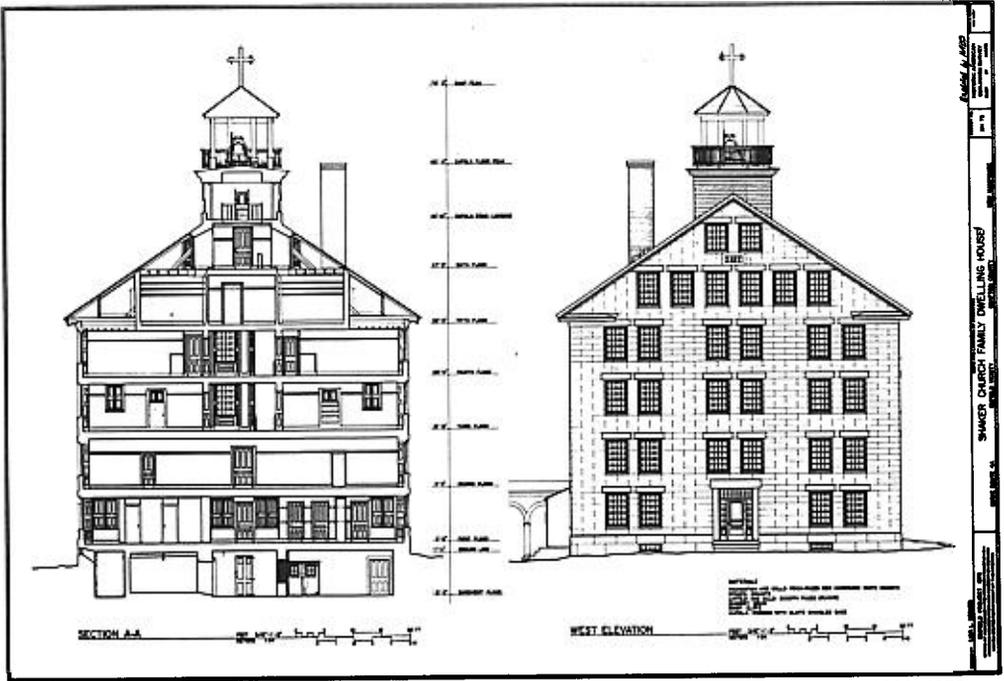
THE GREAT STONE DWELLING, CROSS SECTION AND WEST ELEVATION, 1978. Drawing by the Historic American Buildings Survey (unedited by HABS).
